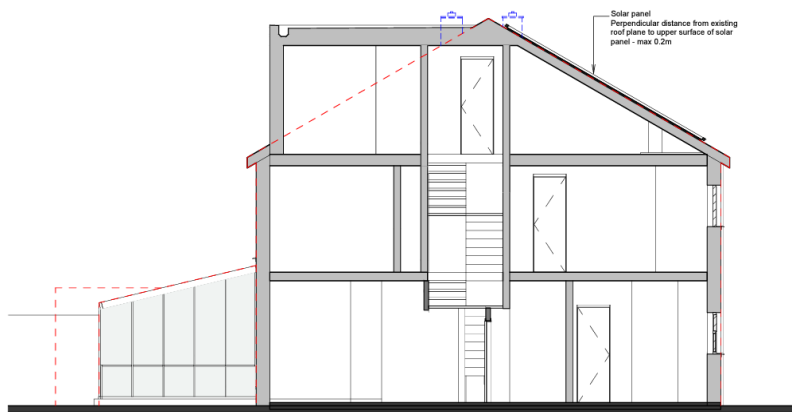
Proposed Section through 94 Temple Sheen Road looking east
